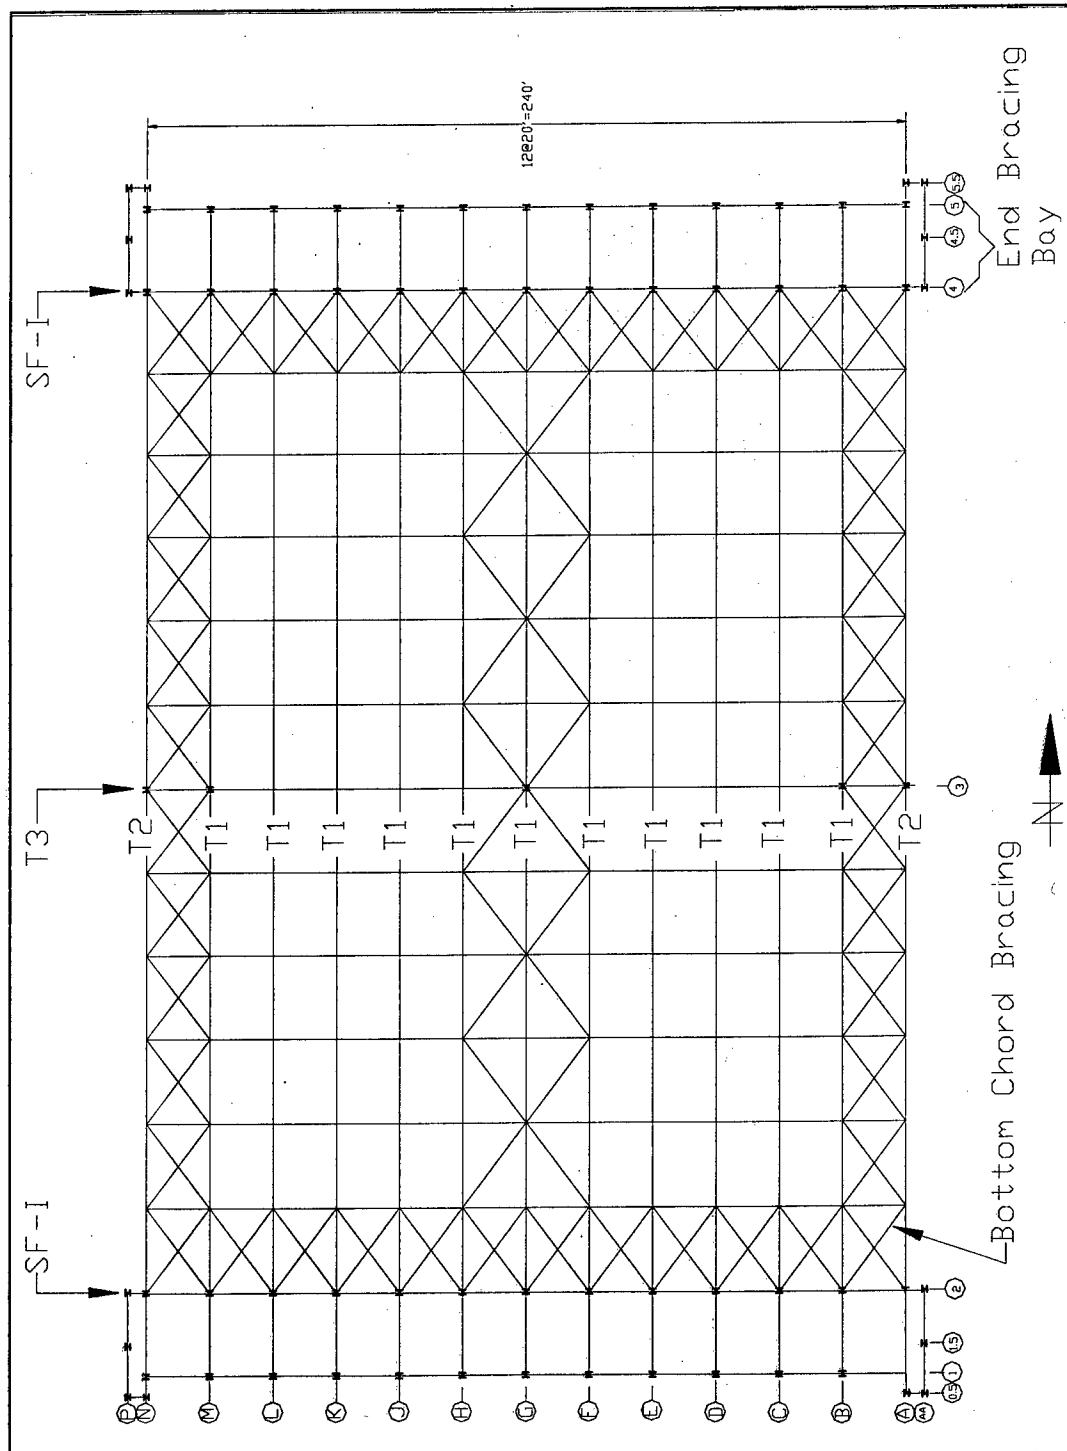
CCAD, TX, truss types in Hangars 43 and 47 (plan view).
